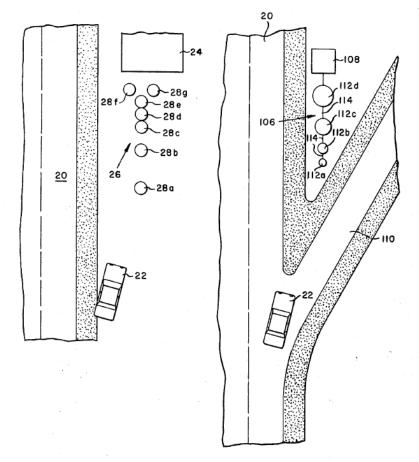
Top Plan Views of two Potential Barrier Configurations
